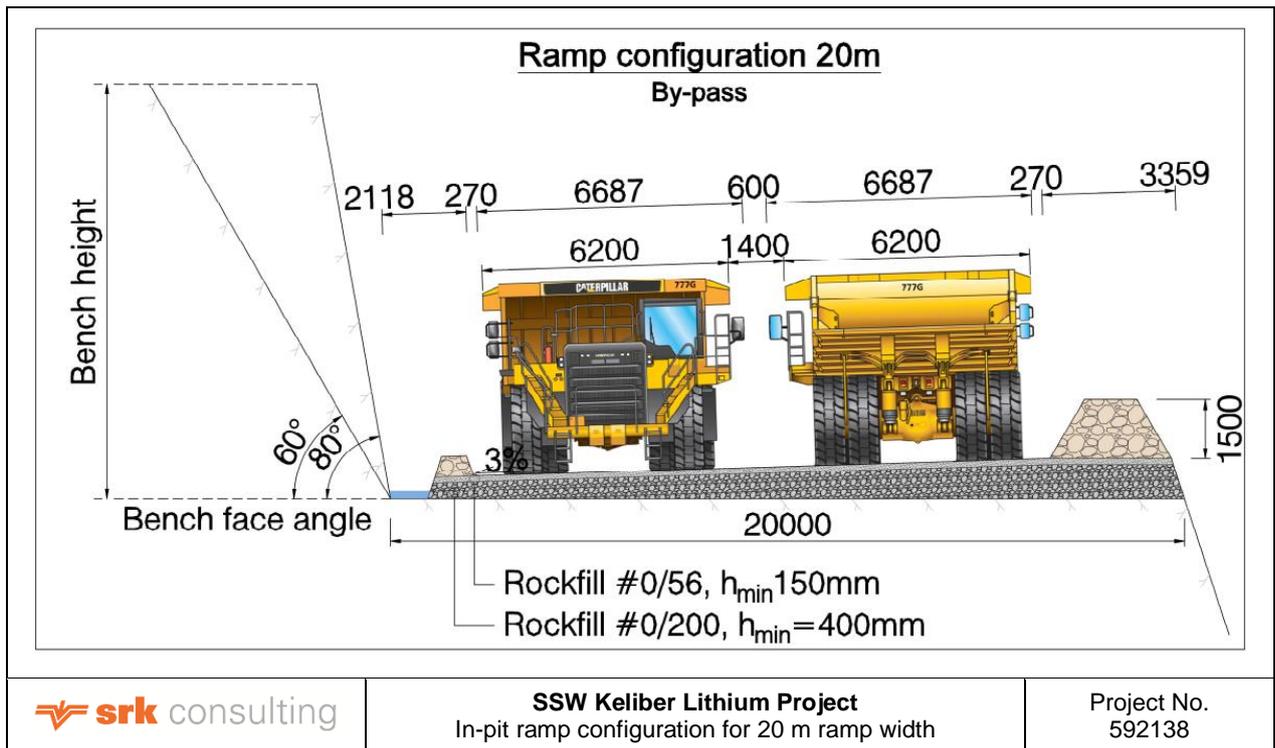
In-pit ramp configuration for 20 m ramp width
